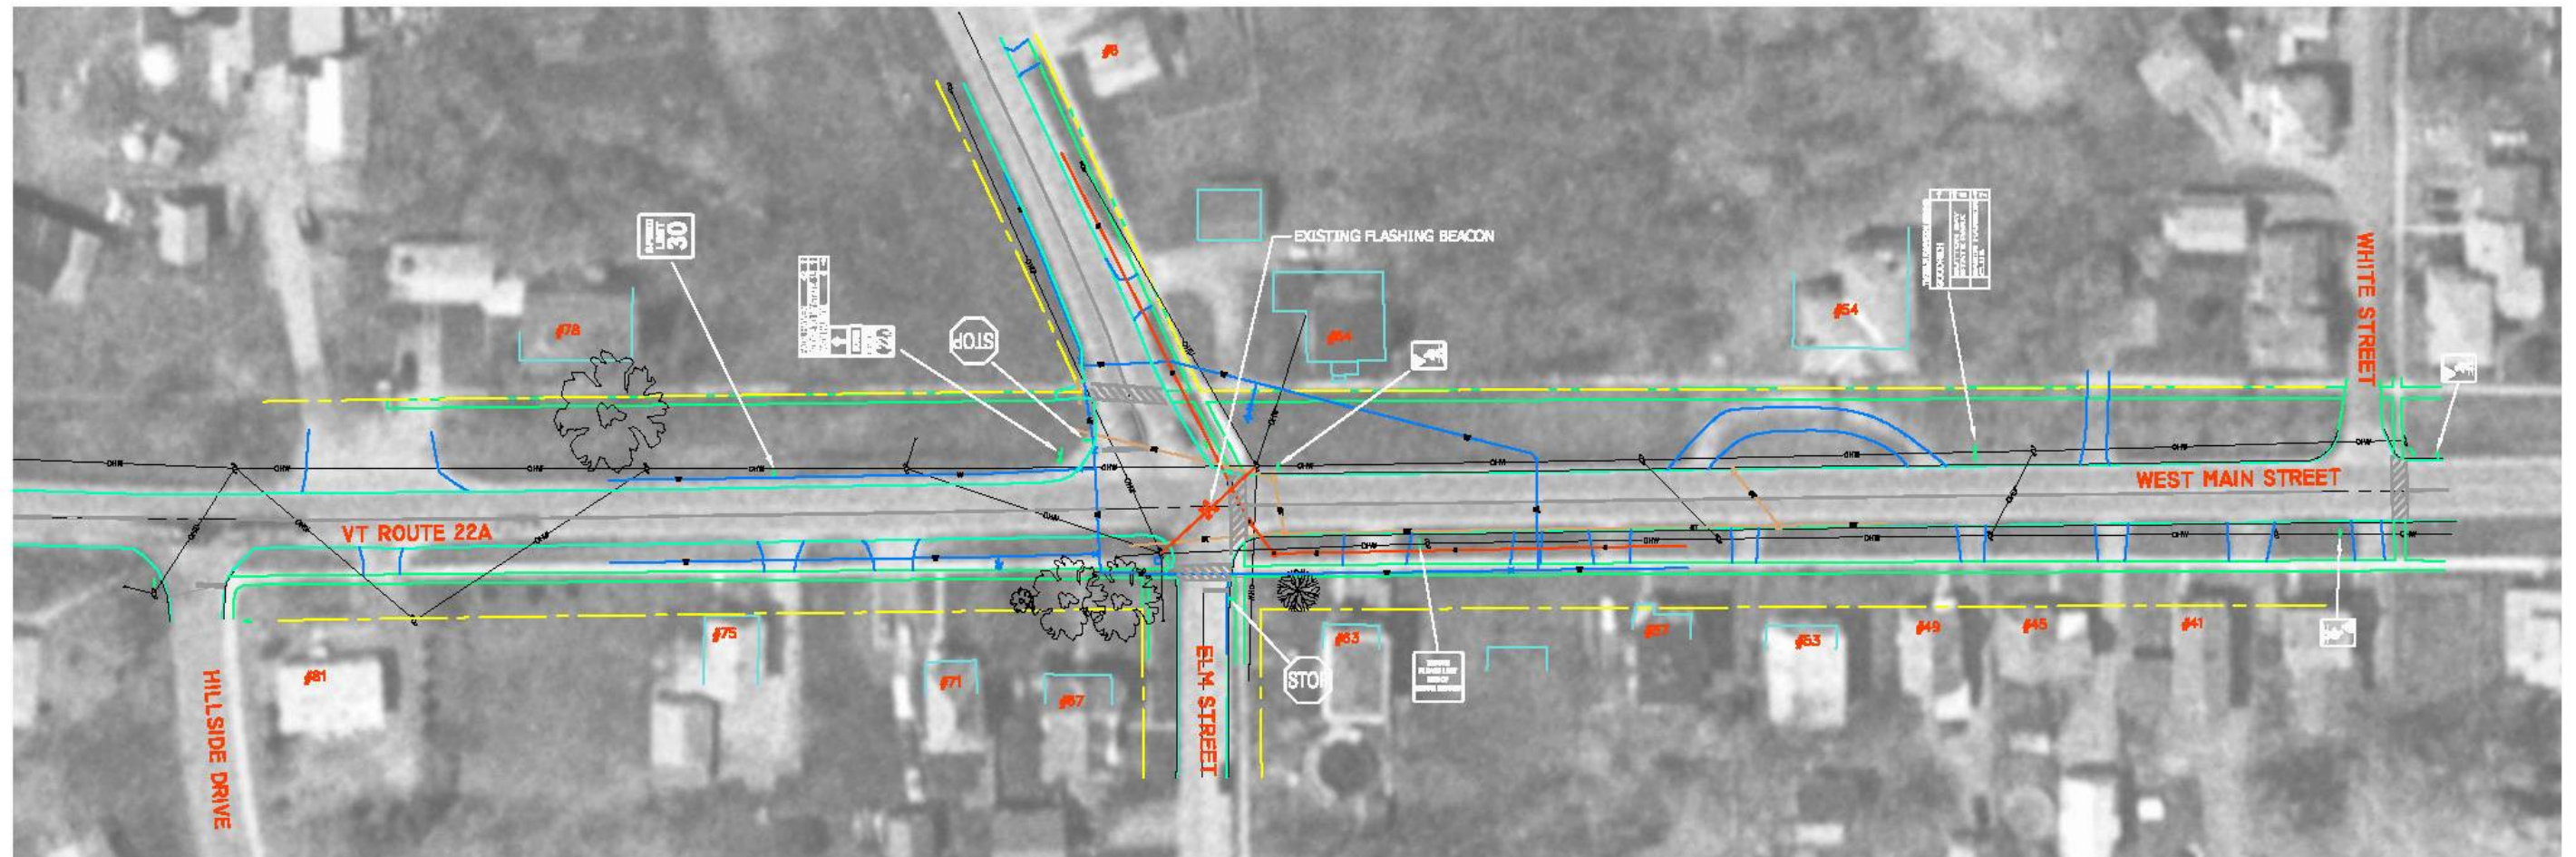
Alternative C1 – Two-Way Stop Control w/ Pantan Road Widening
